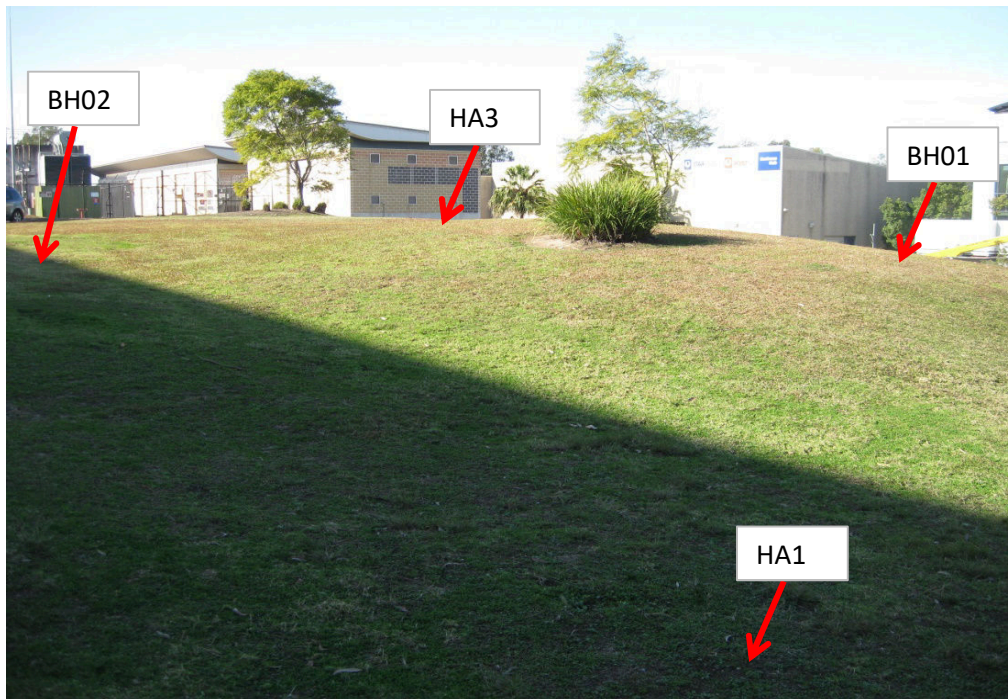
View north-east towards the existing substation and across the proposed substation footprint. The approximate locations of the tests are indicated as shown.
